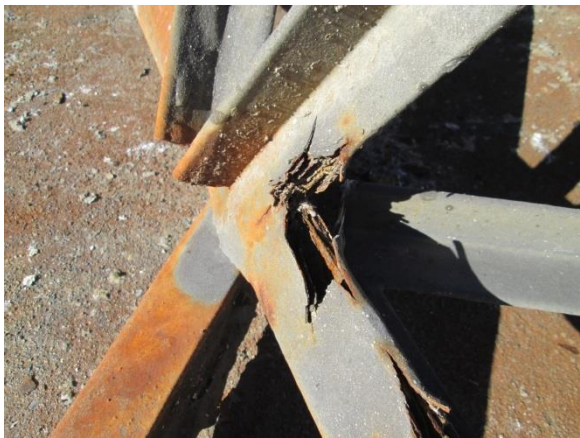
Typical coating failure and exfoliating corrosion products on PC 1 rake arms.
